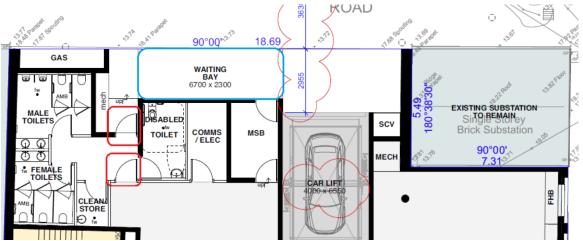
excerpt of the Groundfloor Plan (Decision Plans
